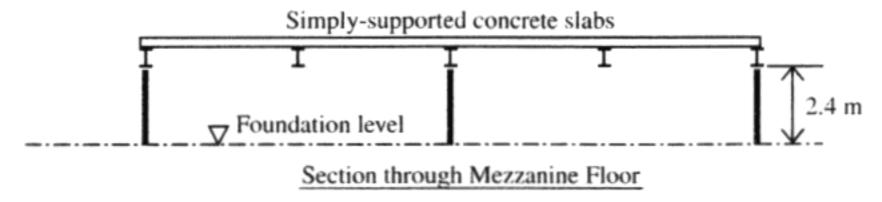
(a): Arrangement of mezzanine floor in Example 1.4
